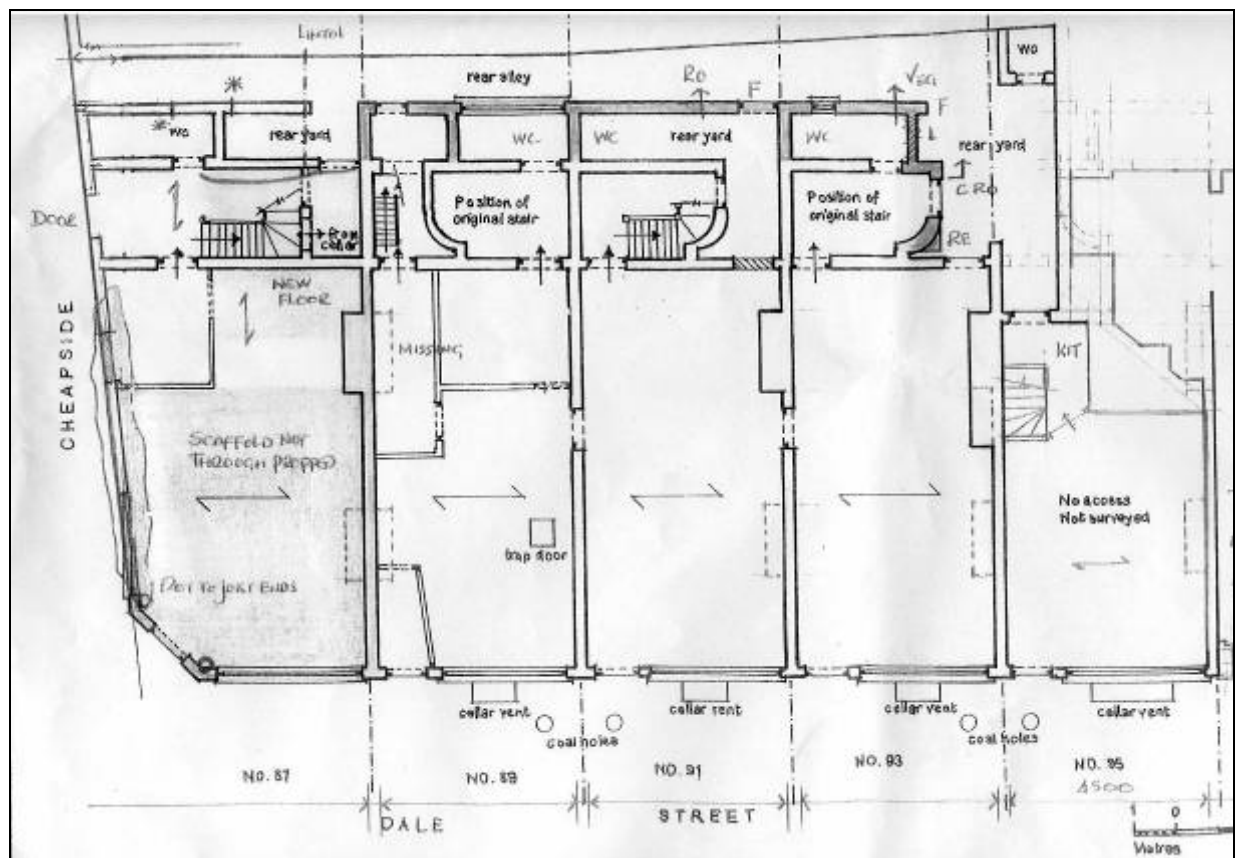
Ground floor plan showing large undivided commercial spaces (adapted from Corbett, 2007)
